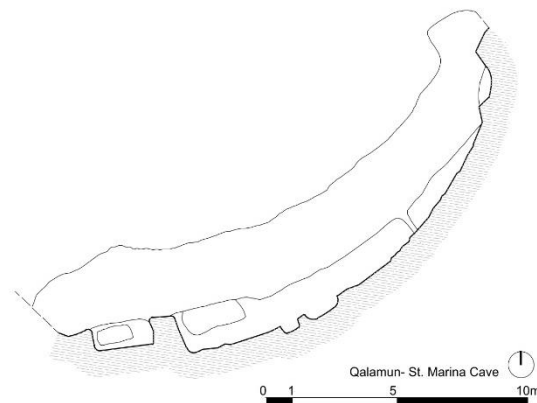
Floor plan of Mār Marīnā cave, Qalamun, drawn by the author.
